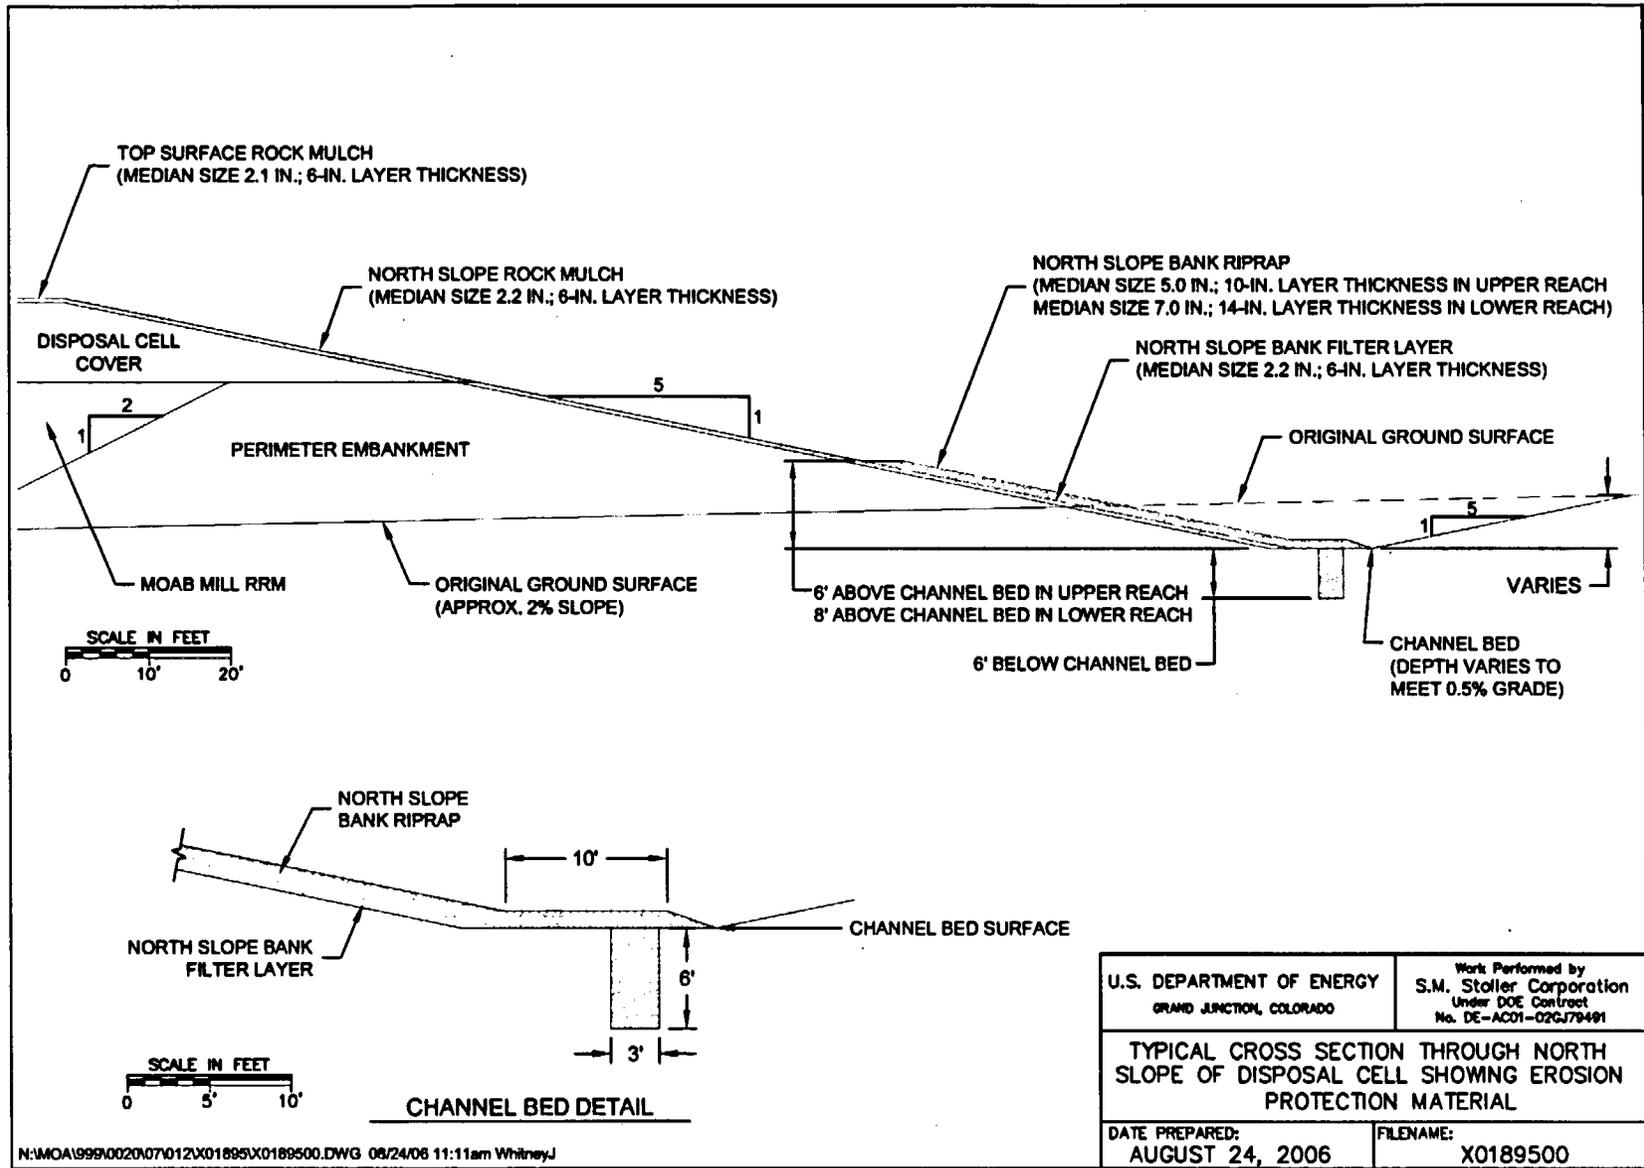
Typical Cross Section Through North Slope of Disposal Cell Showing Erosion Protection Material
